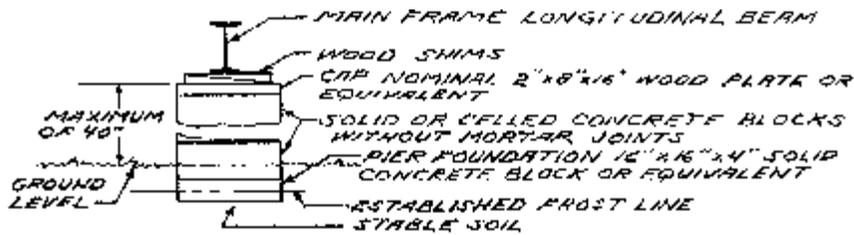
PIERS UP TO 40" IN HEIGHT (SINGLE BLOCK CONSTRUCTION)
